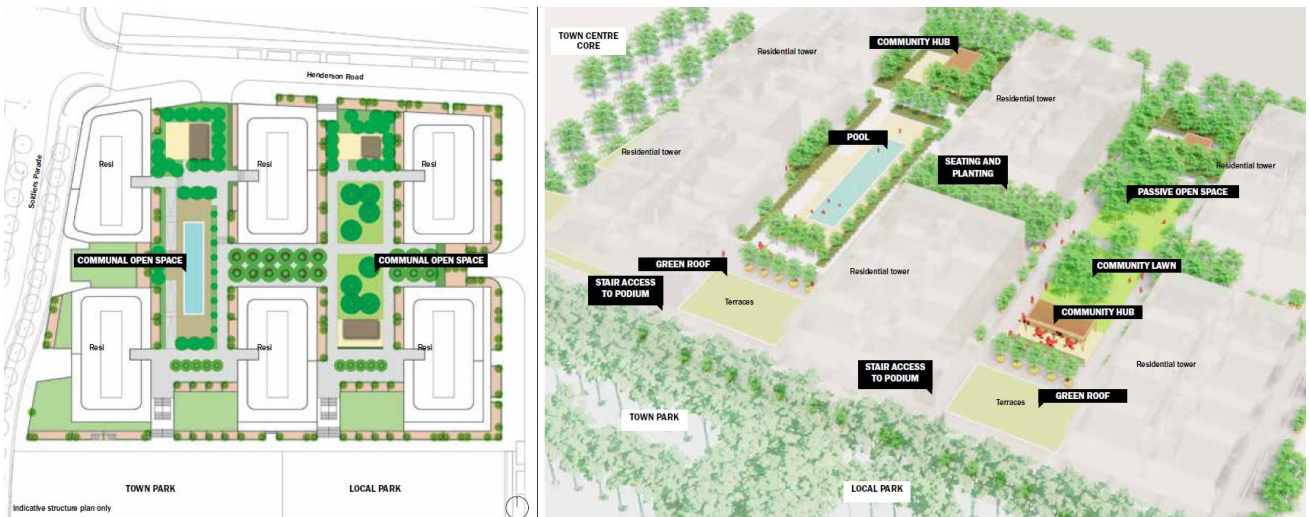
Indicative concept plan and layout of High Density Residential communal outdoor podium
